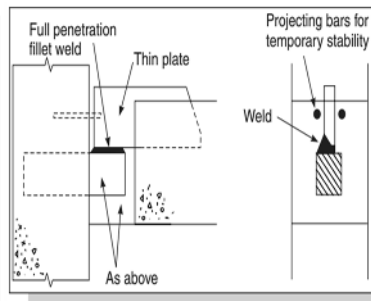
Welded plate beam-to-column hidden connection.
